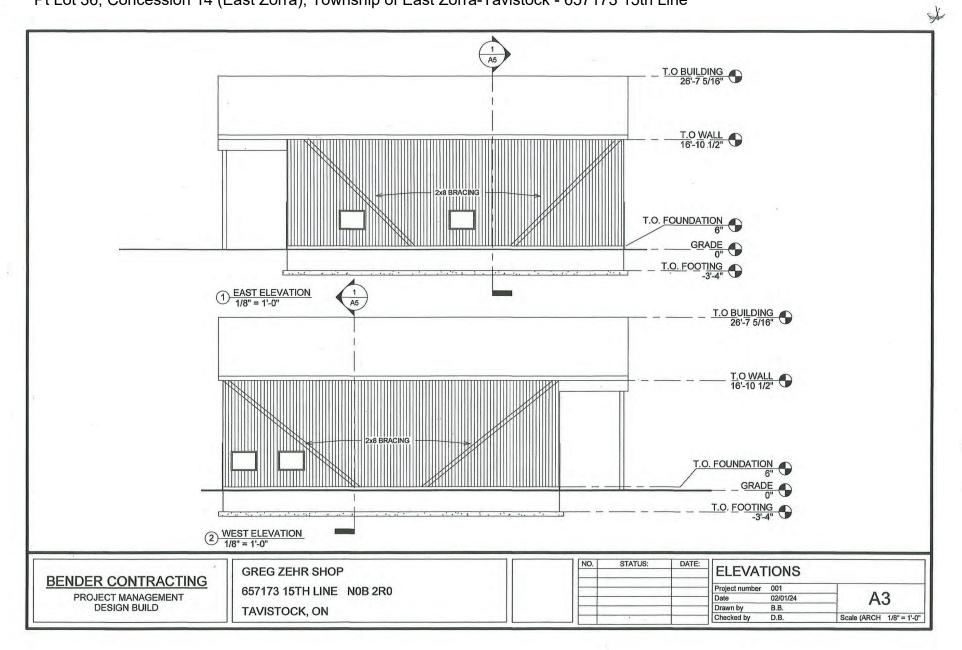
Applicant's Sketch - Elevations File No. A01-24 (Zehr) Pt Lot 36, Concession 14 (East Zorra), Township of East Zorra-Tavistock - 657173 15th Line
